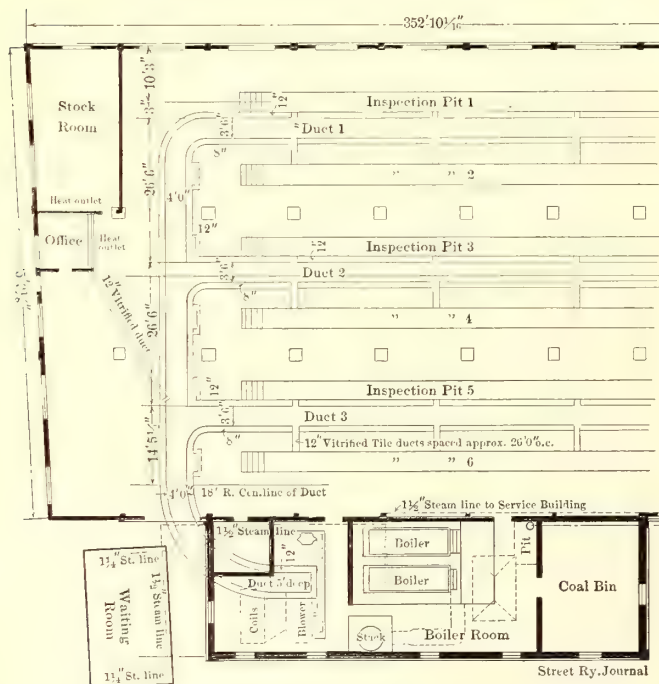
LAYOUT OF HEATING CONDUITS AND STEAM LINES
